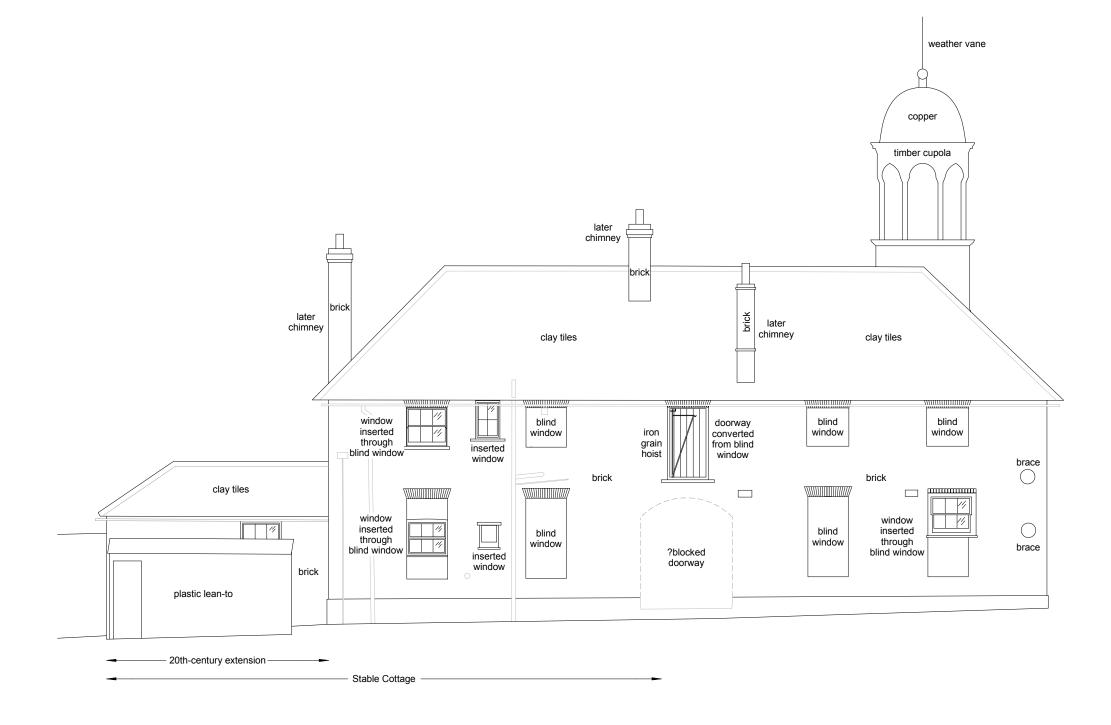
Structure 1/2, 18th-century stable block south-west elevation.
